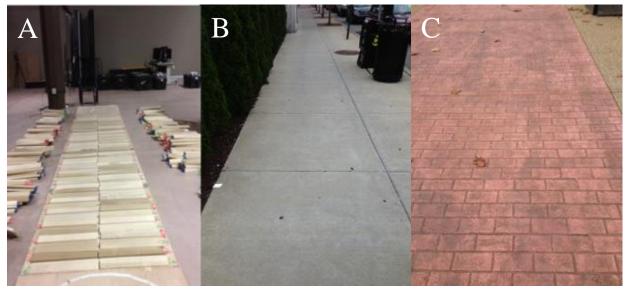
Surfaces used for testing and characterization of PathMeT (A) engineered surface (B) concrete surface (C) stamped concrete surface
